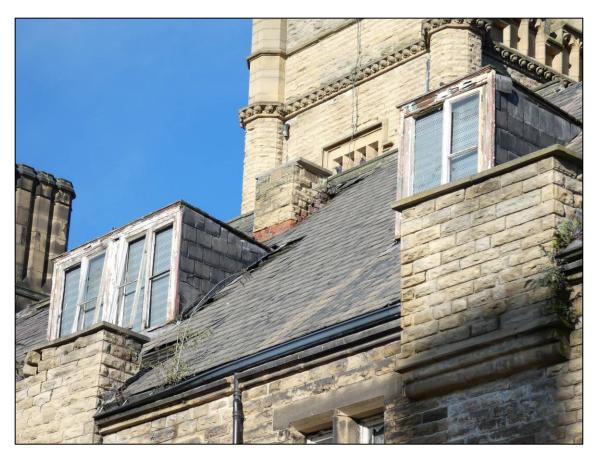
Second floor rooms (2F2 and 2F4), dormer windows, looking NW (photo 1/765).
